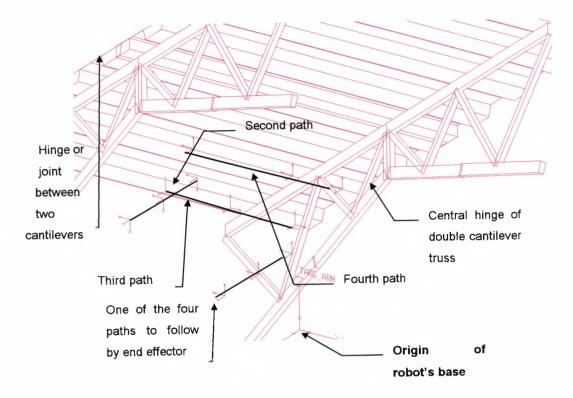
Bridge Detail [C1] according to Table 4.3
